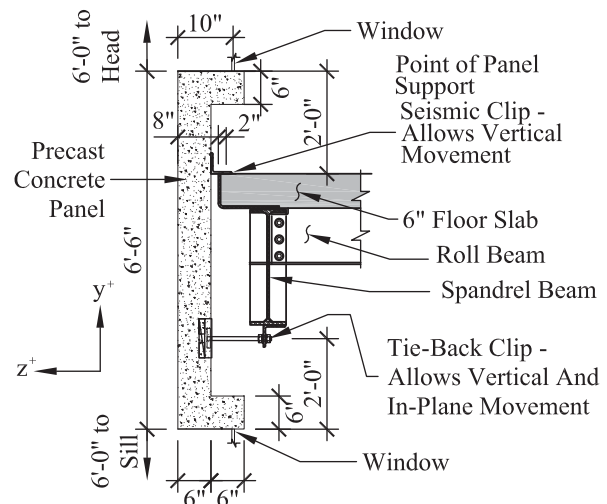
Section of spandrel beam supporting precast concrete panel.
